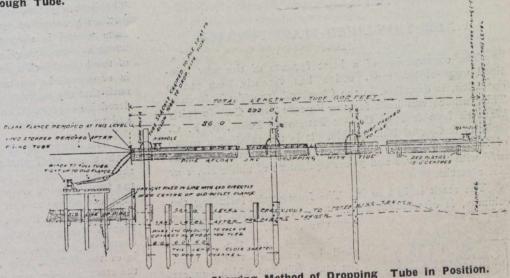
Longitudinal Section Showing Method of Dropping Tube in Position.
